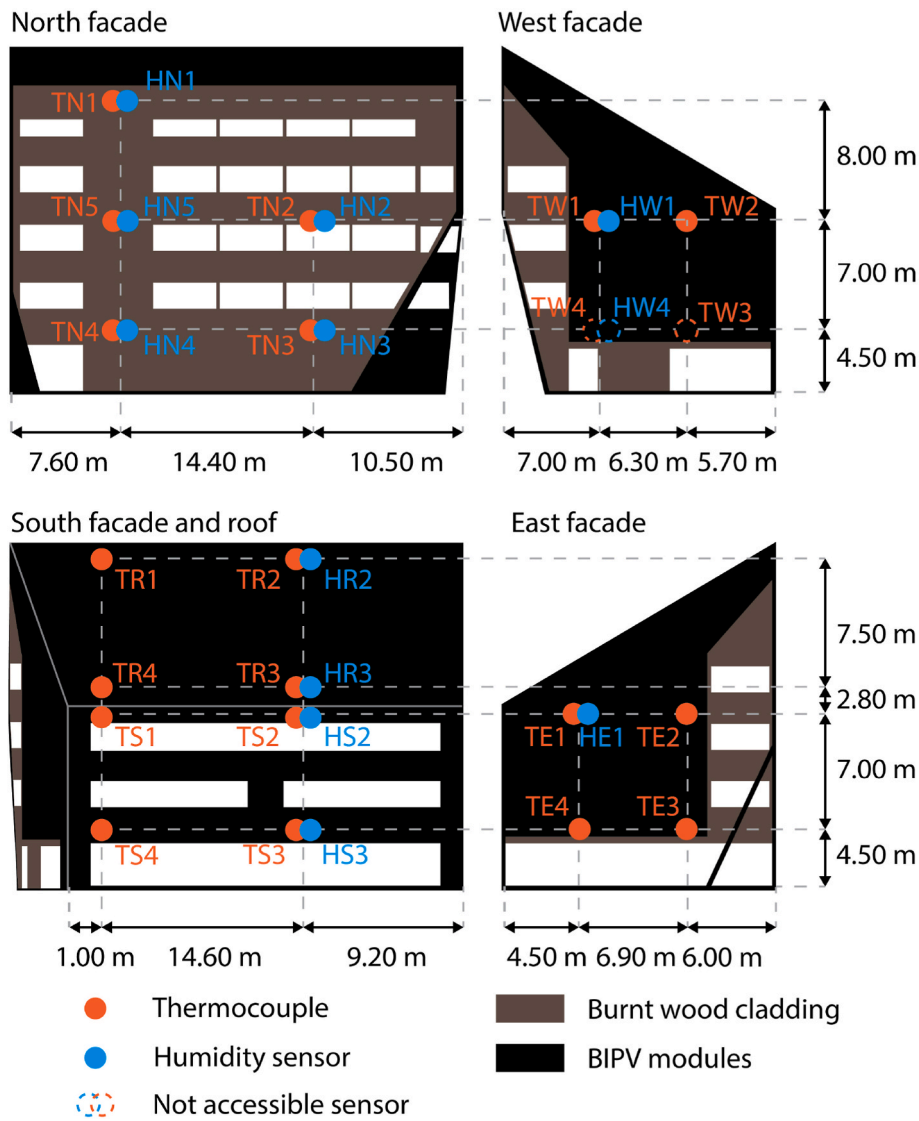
Position of temperature (T, orange dots) and humidity (H, blue dots) sensors in the air gap behind the cladding on the five building envelopes north façade (N), east façade (E), south façade (S), west façade (W), and roof (R) used in this study. TW3, TW4, and HW4 were not accessible for this study. Figure not drawn to scale. (For interpretation of the references to colour in this figure legend, the reader is referred to the Web version of this article.)
